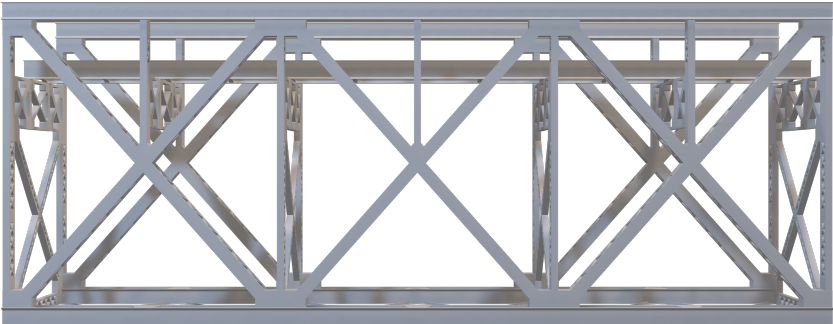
Bridge B7 – truss girder bridge with intermediate bridge deck.
